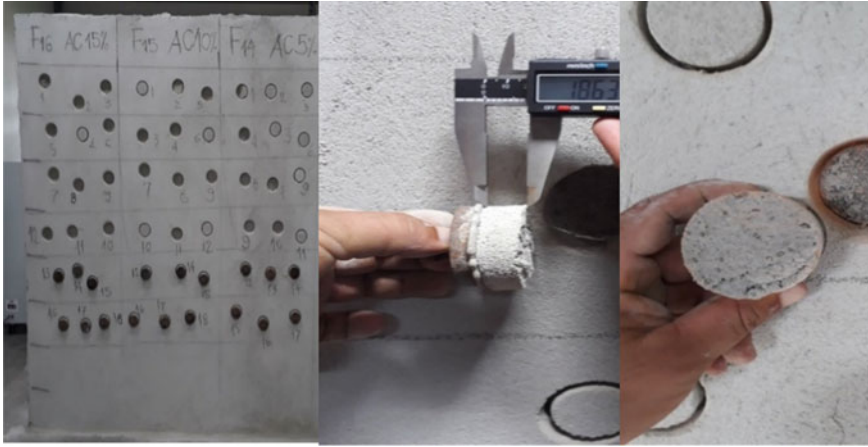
Example of the wall and concrete block tested, checking the pull out thickness and form of ruptures
